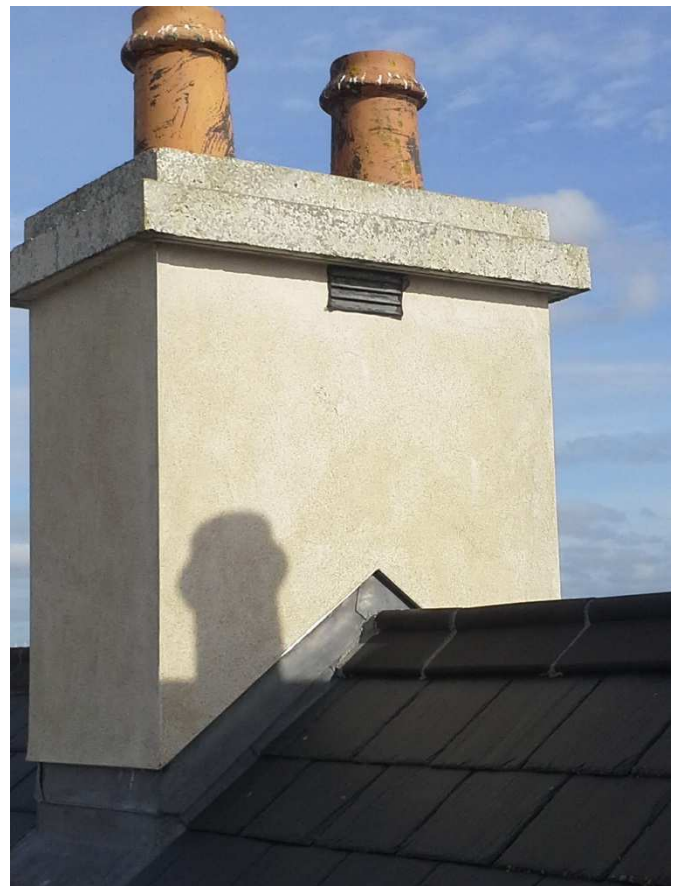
Photos showing new slated roof, new gutter sump and outlet with welded lead lining. Also repairs to chimneys including flashing, vents, render and pot refitting.
